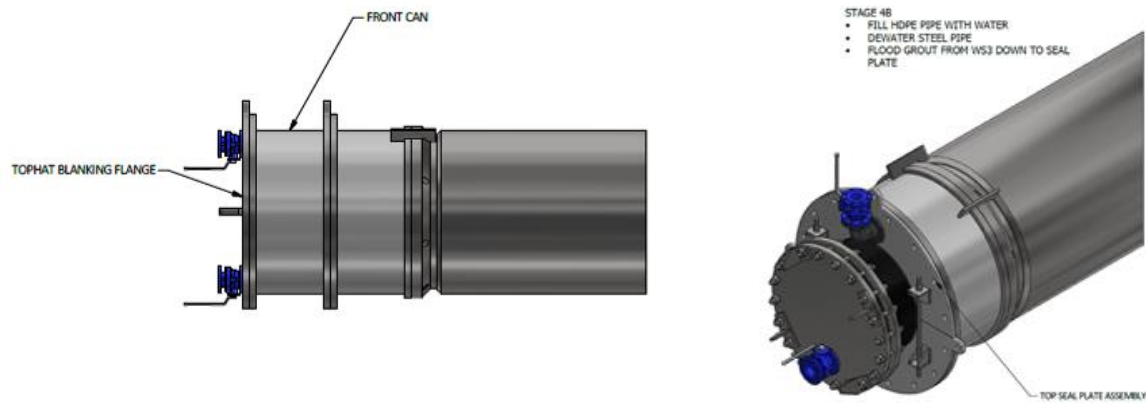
Top Hat – Temporary works design Full unit (Left) Liner installed (Right)
